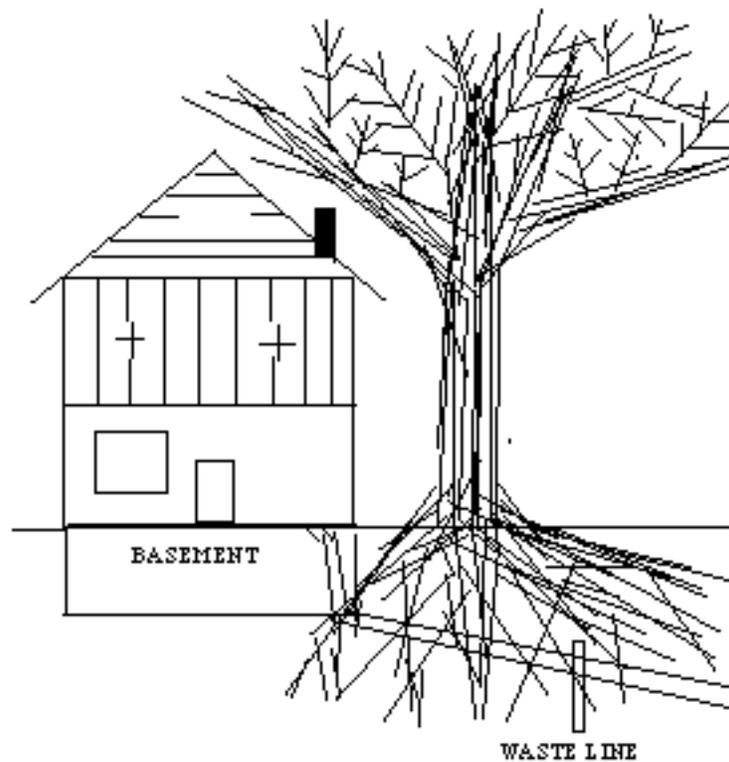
A tree's root system can damage a home's plumbing and foundation.
